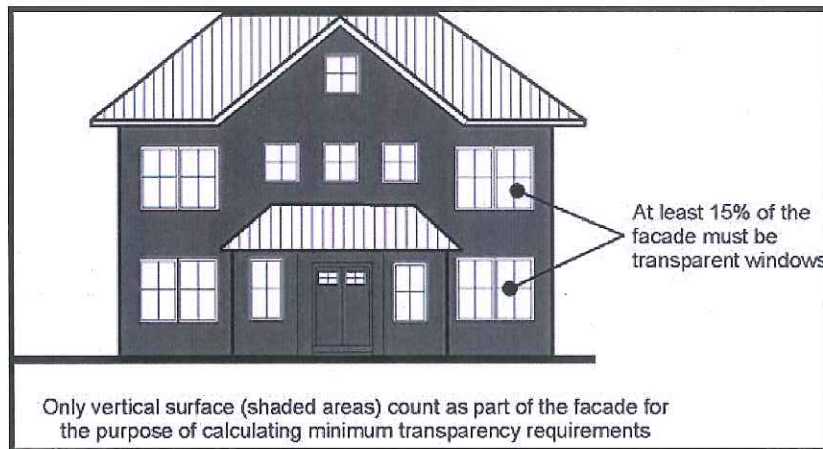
Illustration of façade transparency requirements which enhance safety and the relationship to the street front.
